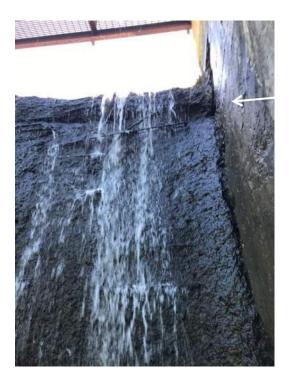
View of the lower portion of the LT spillway abutment wall; crack noted.
